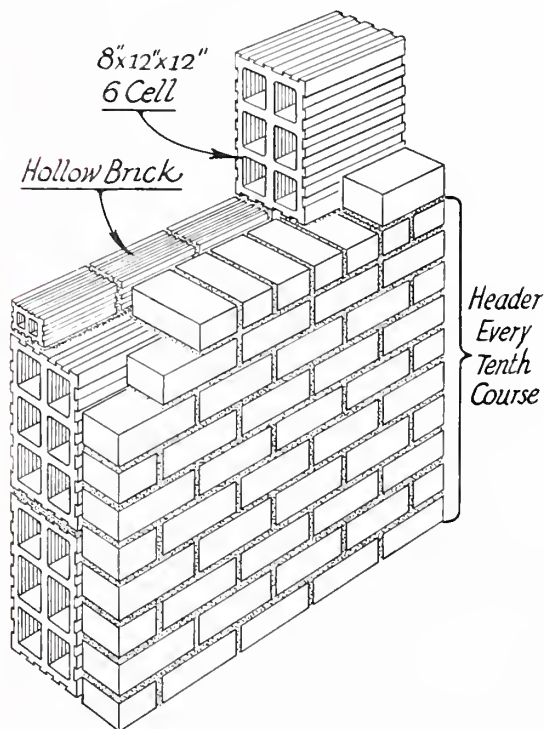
Twelve-inch brick veneer load bearing wall, illustrating use of 8"x12"x12" load bearing tile, as backup with hollow brick to provide header bond
